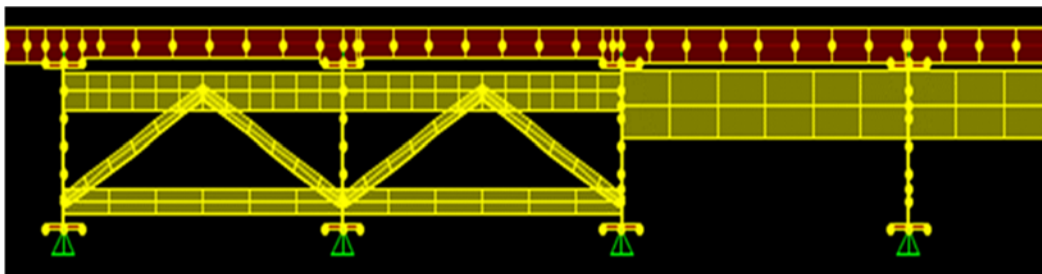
Typical Cross Section View of Half of the Bridge in SAP2000
